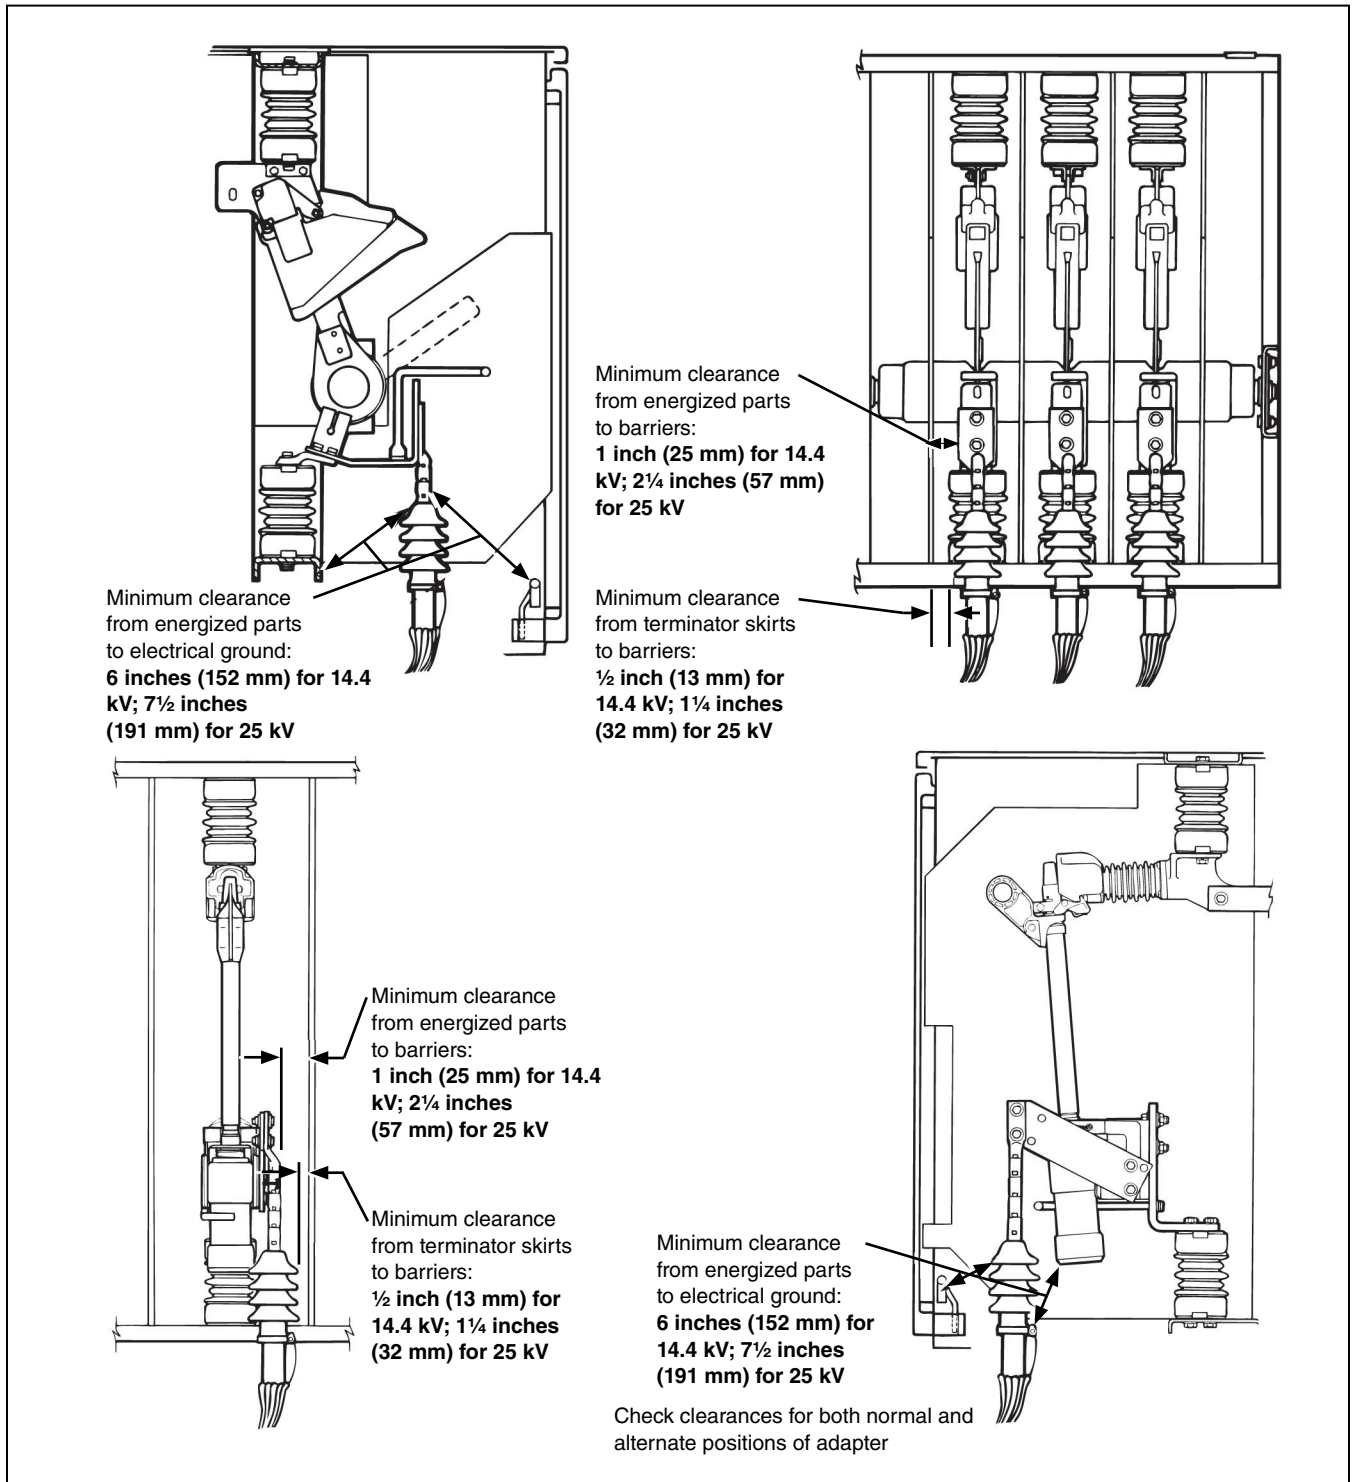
Minimum clearances that must be maintained when installing cable terminators.
